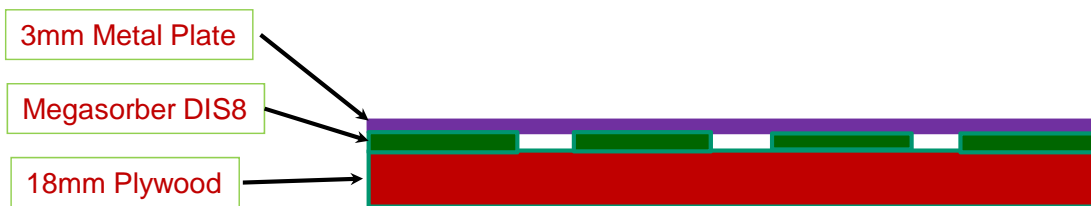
The schematic drawing of Megasorber DIS8 floor system.
